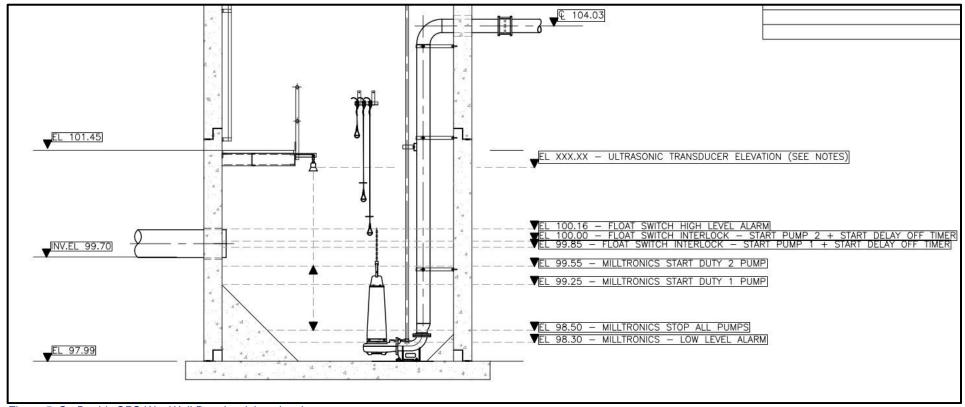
St. Davids SPS Wet Well Drawing (elevations)
